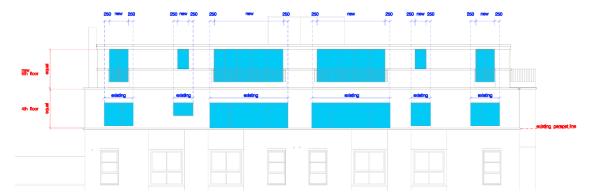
Proposed matching window arrangement at 4th and proposed 5th floor, Glebe House
